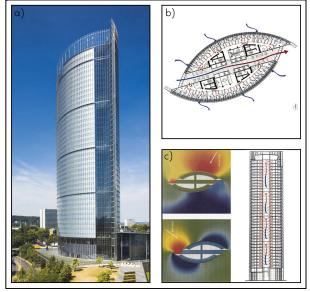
Post Turm, Bonn, 2002: a – view; b – floor plan and cross ventilation diagram; c – pressure distribution around the building and gravity ventilation diagram
